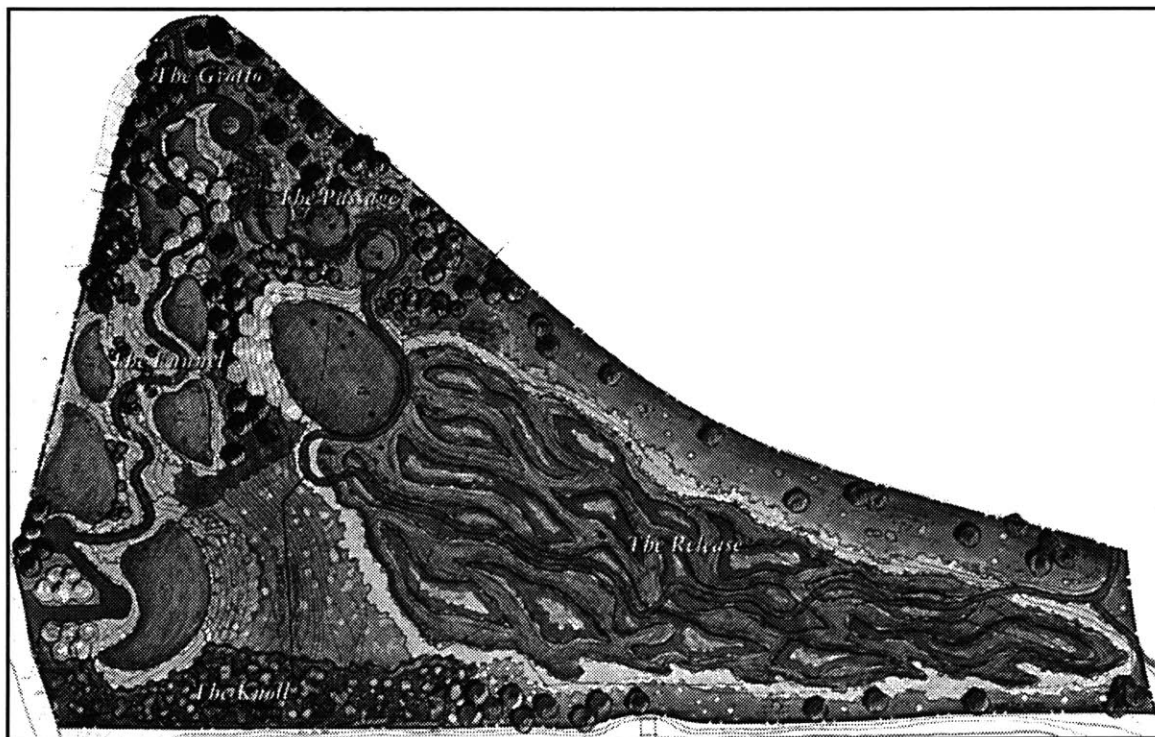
Lorna Jordan, *Waterworks Gardens Site Plan
